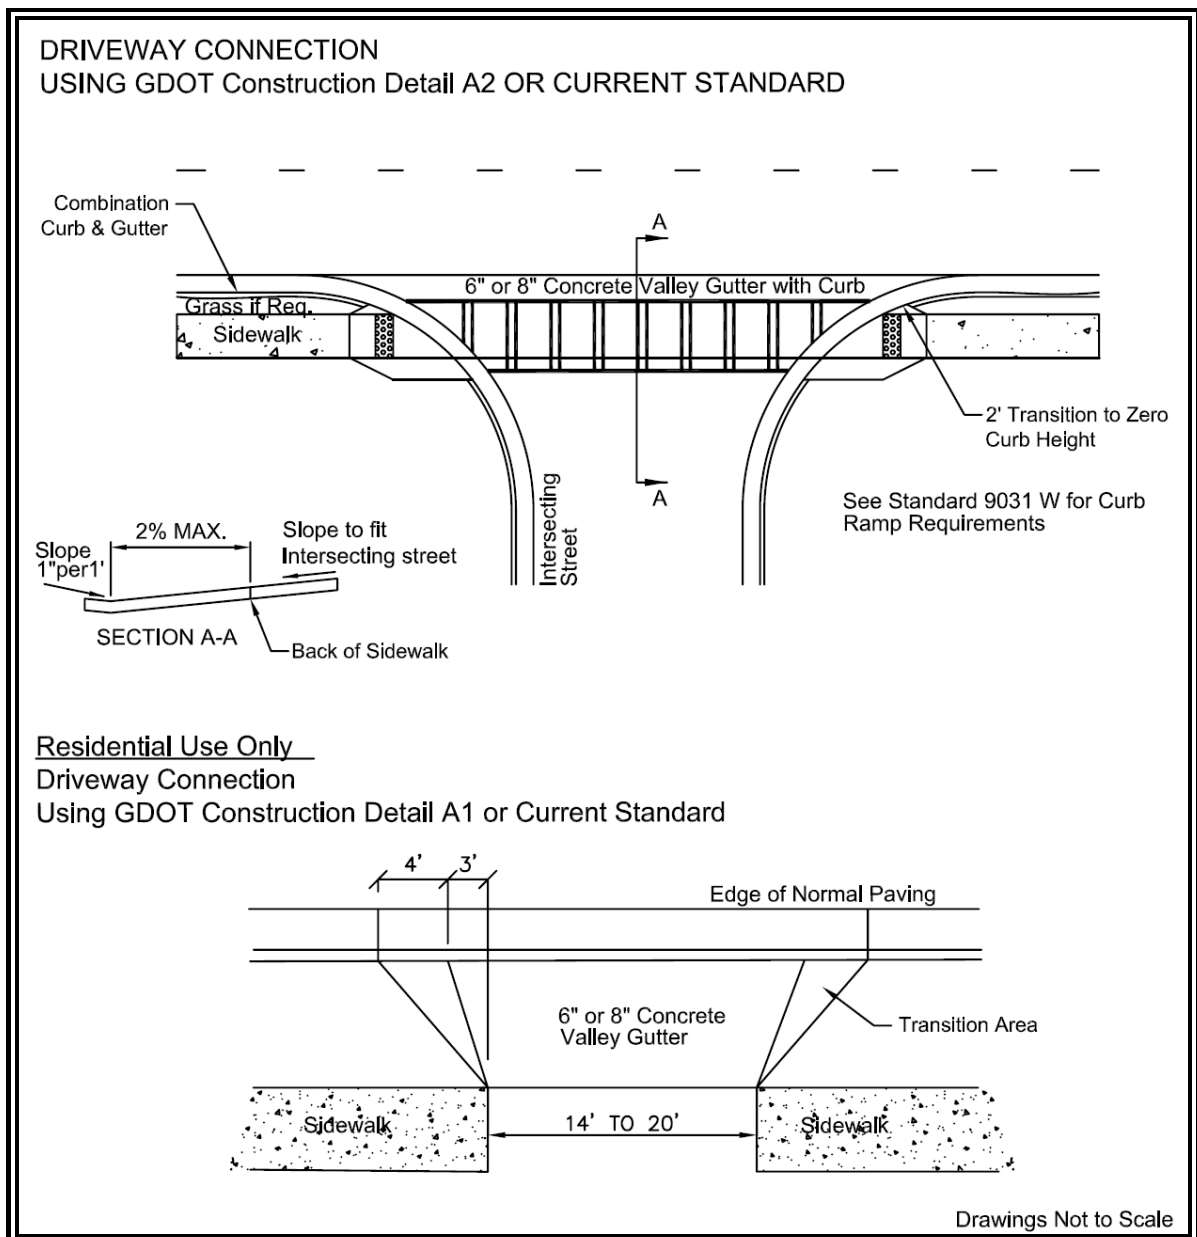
DRIVEWAY CONNECTIONS TO URBAN SECTIONS
